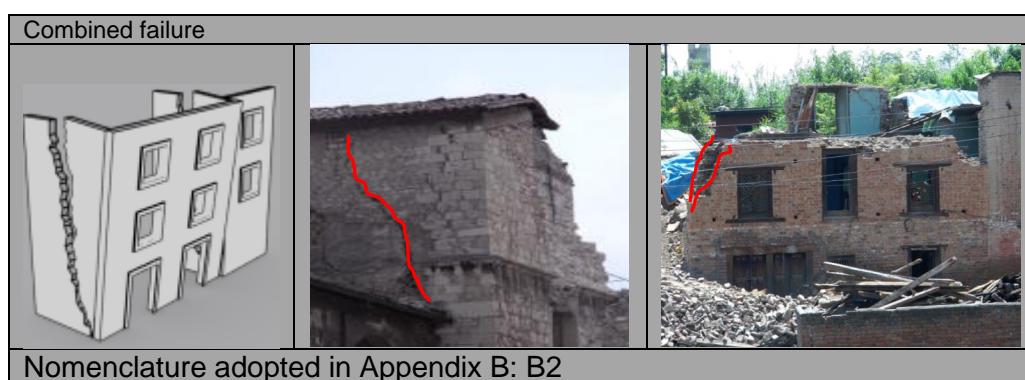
Combined failure modes due to good connections between adjacent façades and lack of connections between adjacent façades and walls. Examples of buildings in the historic centre of L'Aquila in Italy (left), Kathmandu in Nepal (right)
